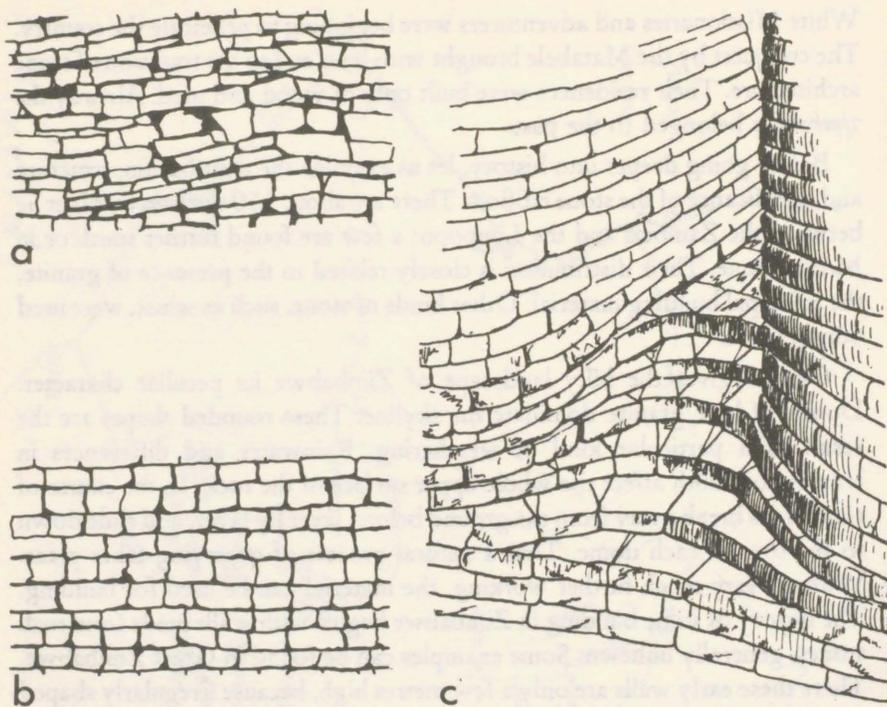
Great Zimbabwe: early style of building (a), developed style of building (b), developed style of building, entrance (c)
